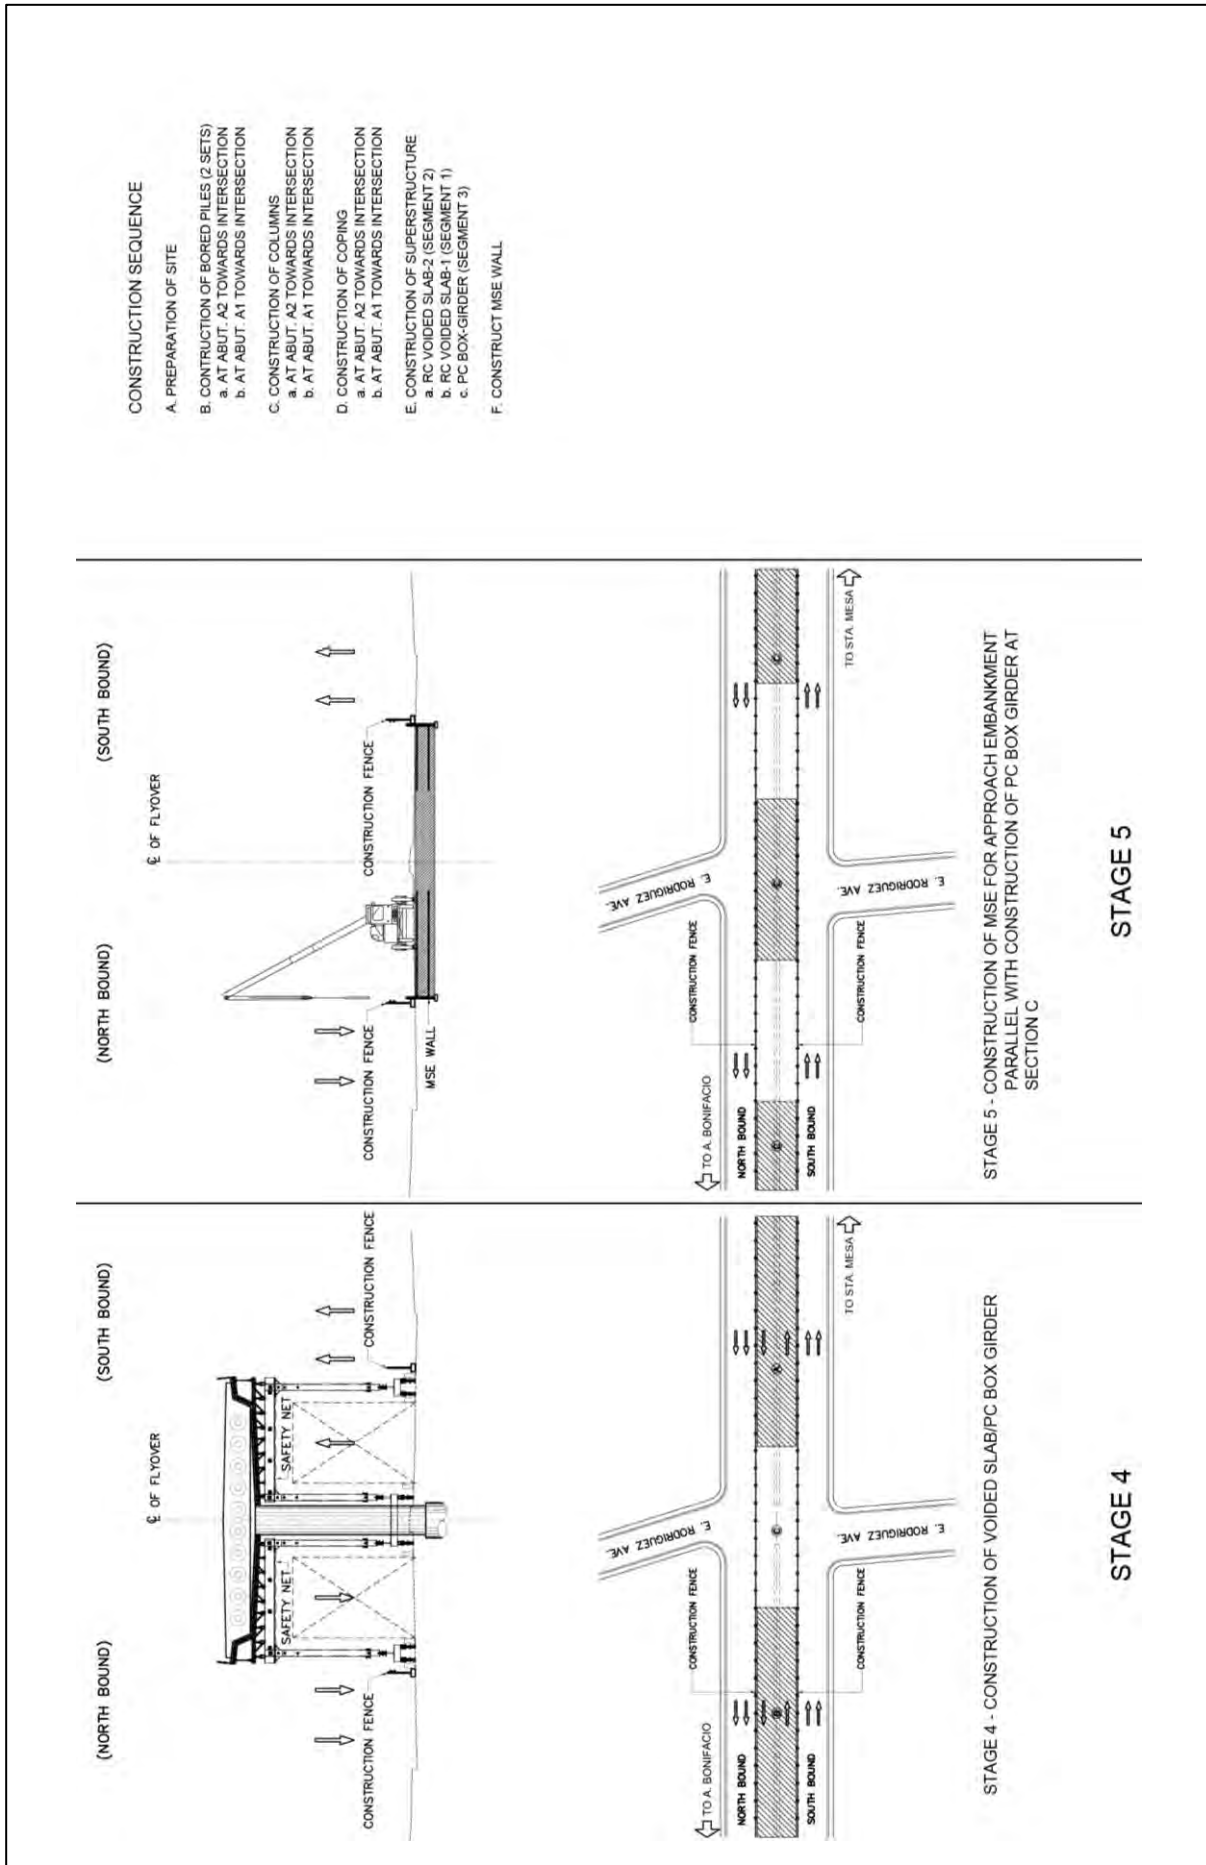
Construction Plan for C-3/E. Rodriguez Interchange (2/2)
